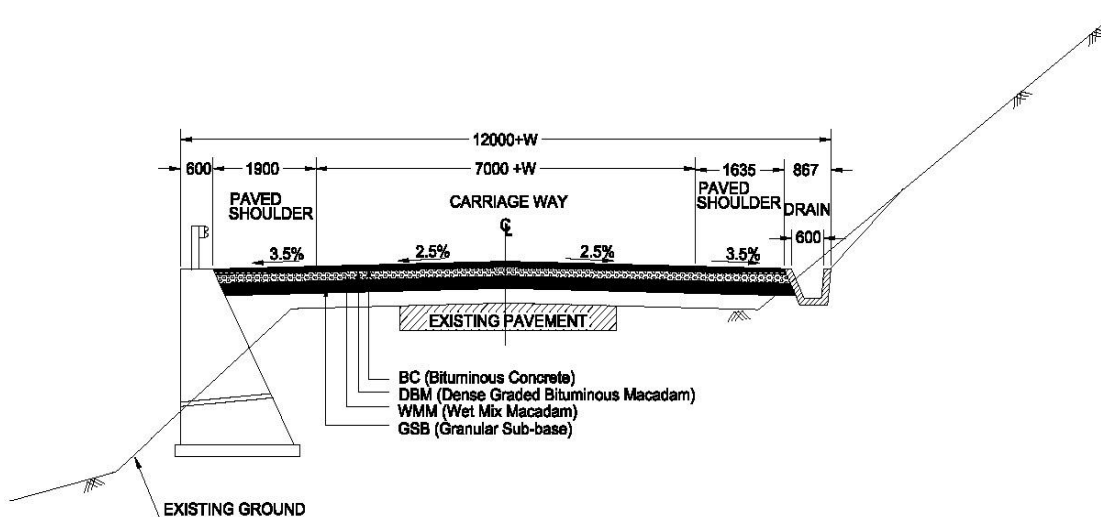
(2): Typical Cross Section for Widening Primarily to Valley Side
